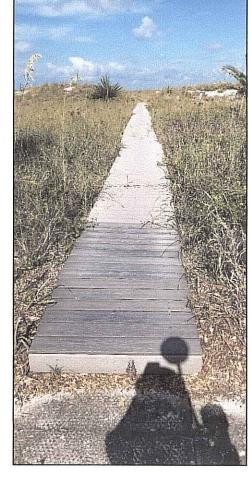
SIGN (SEE SHEET 3 OF 7)
